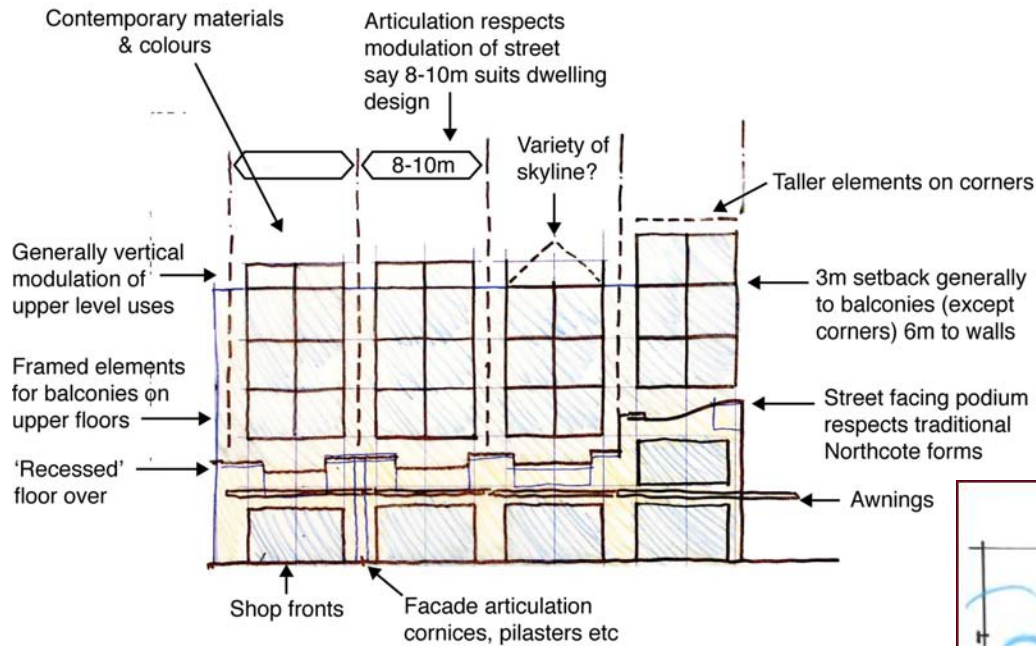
Treatment of existing shopfront redevelopment – details vertical articulation into narrow / vertically aligned components
